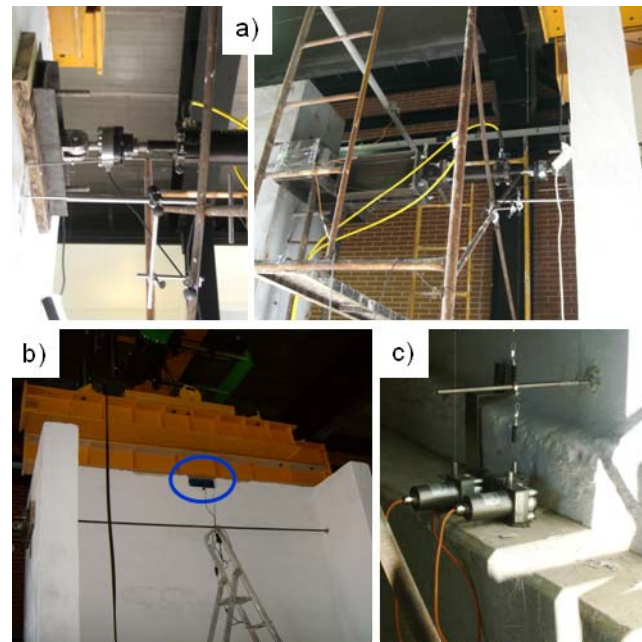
Test set-up and instrumentation: a) hydraulic actuator; b) additional vertical load, seismograph, longitudinal steel bar; c) displacement transducers.
